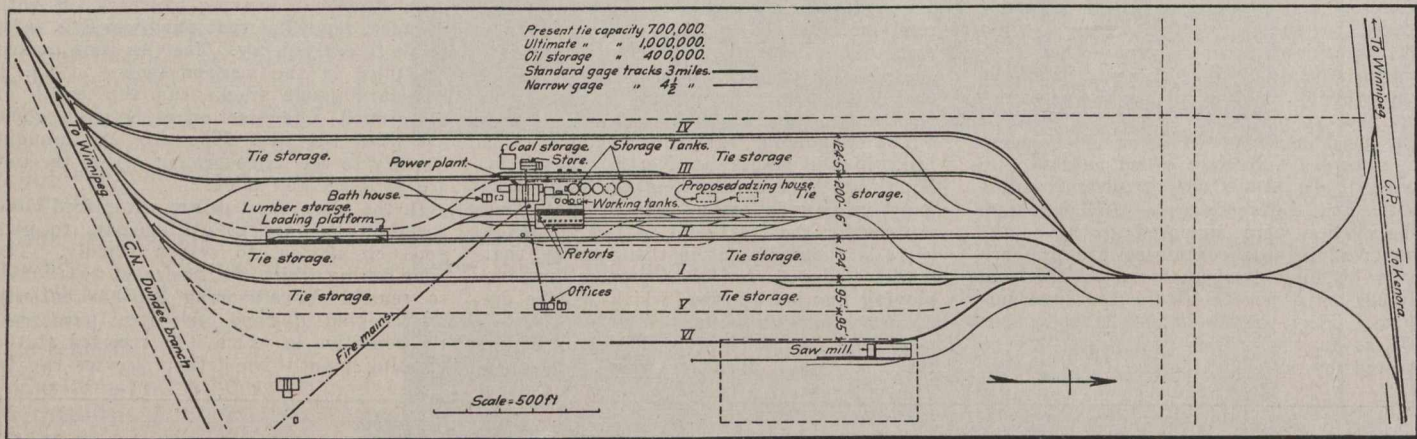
Layout of Buildings and Yard of Creosoting Plant.
